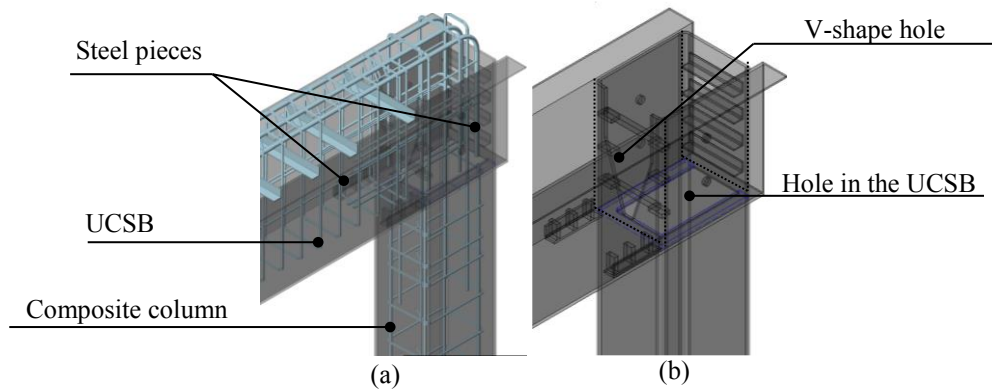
Details of the hybrid joint: (a) with steel rebars (b) without steel rebars
